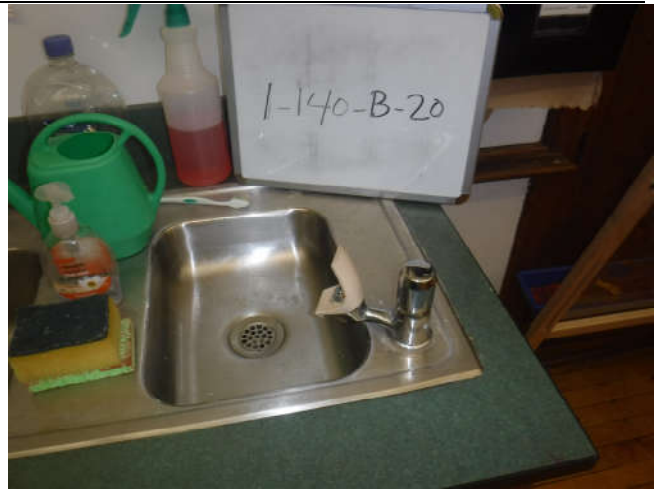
Bubbler, located on the 1st floor in Pre-K across from Rm 130 & stairs #6
